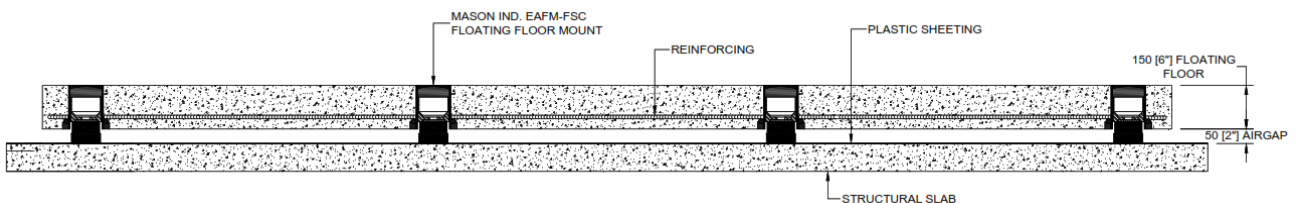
Prototype Floor Layout Section – Natural Rubber Bearings
